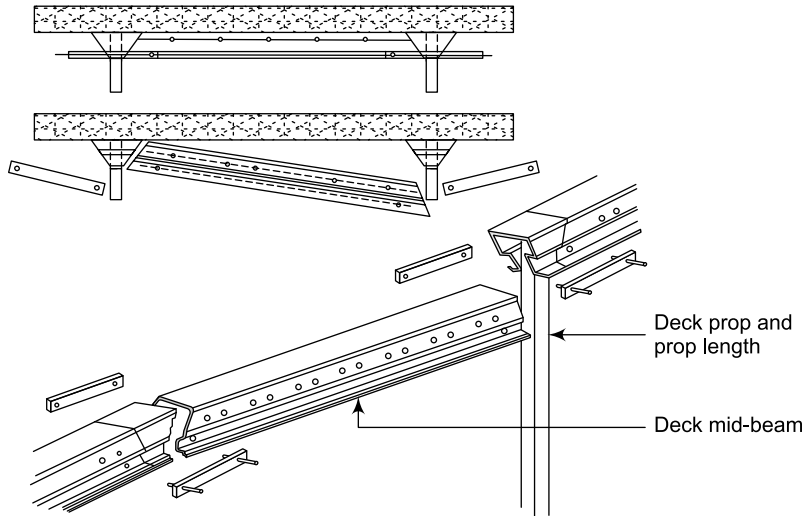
Assembly of Slab Formwork (Courtesy Mivan).
